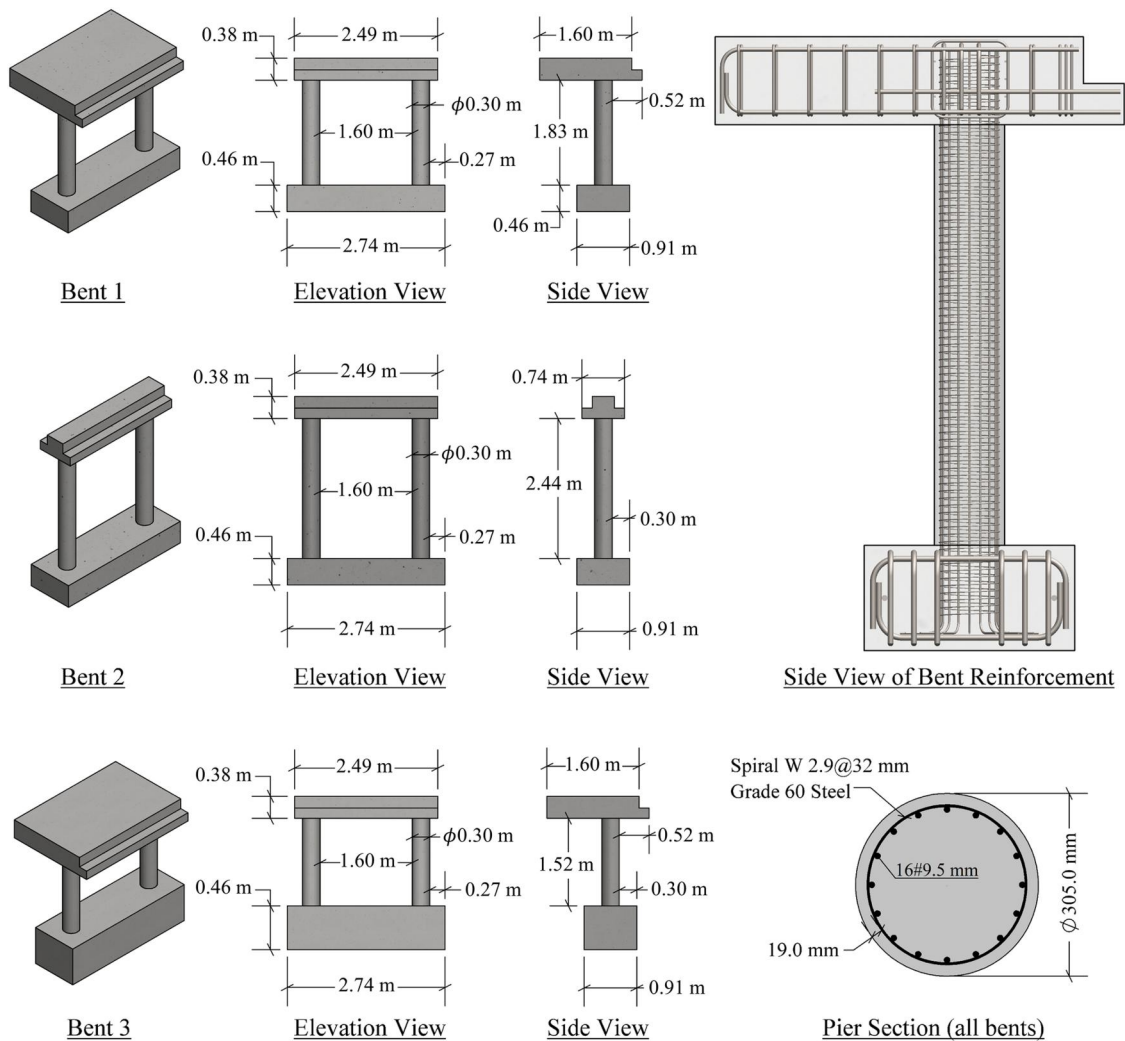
Geometrical details of bents and piers of the two-span RC bridge tested by Johnson et al. (2008).
